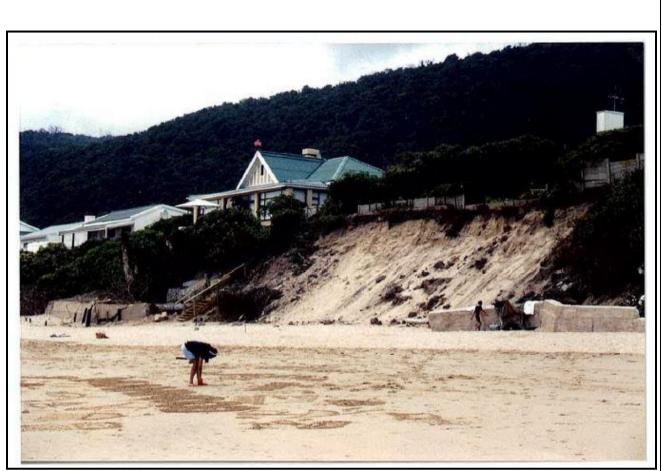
Damage to retaining wall and dune along Wilderness Beach due to the above mentioned high tide event.
